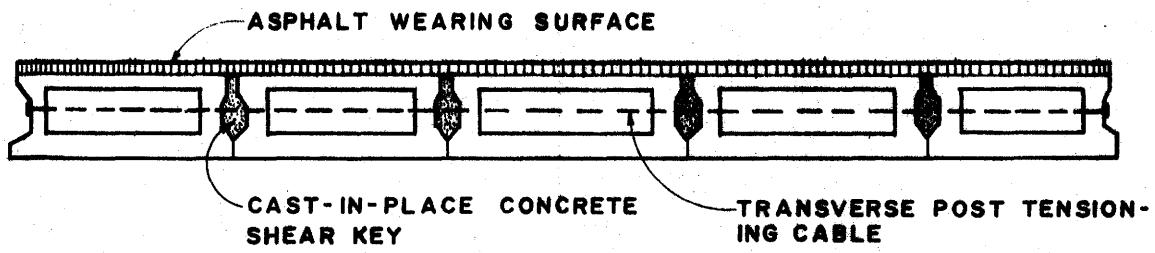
CROSS SECTION OF TYPICAL MULTI-BEAM PRESTRESSED CONCRETE BOX GIRDER BRIDGE
